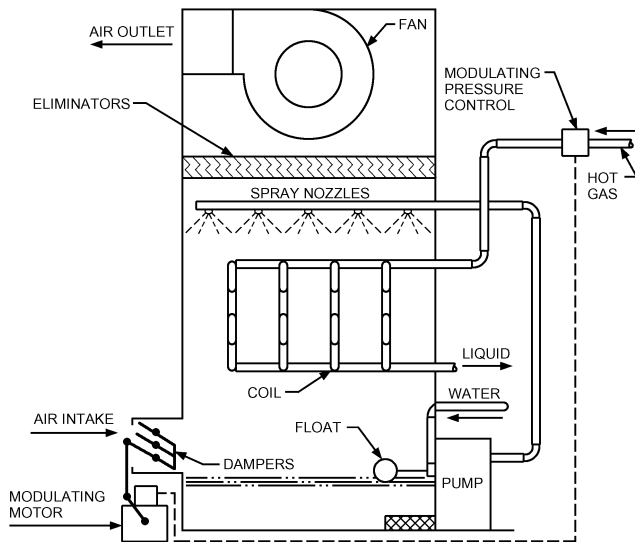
Head Pressure Control for Evaporative Condenser (Air Intake Modulation)
